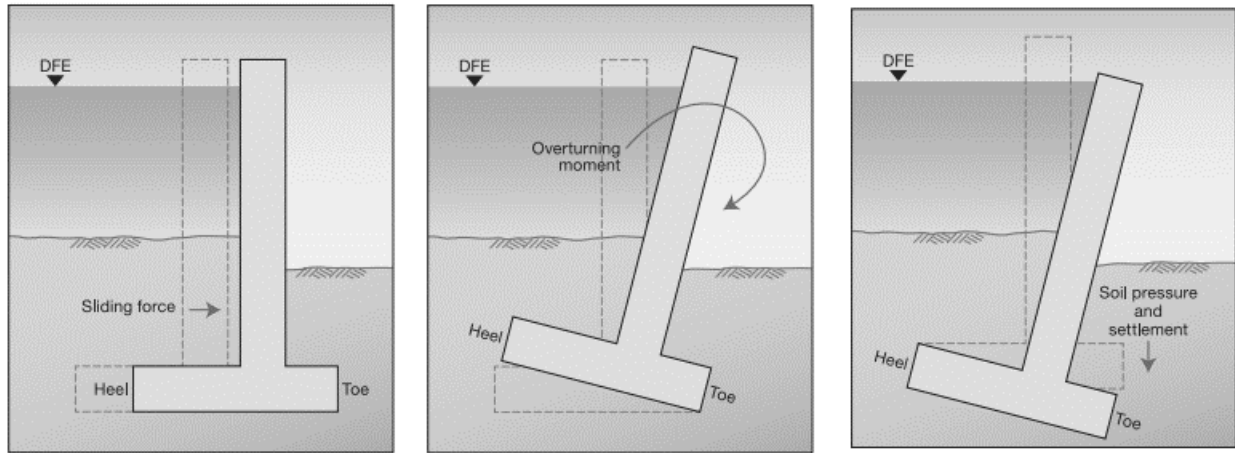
Failure by sliding, overturning, and compression failure of foundation (FEMA259 [6]).
